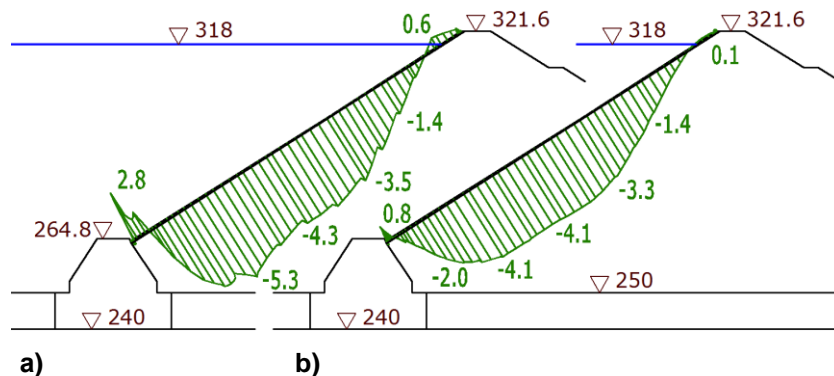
Longitudinal stresses in reinforced concrete face (MPa) in Alternative 1 a – on the upstream face, b – on the downstream face
